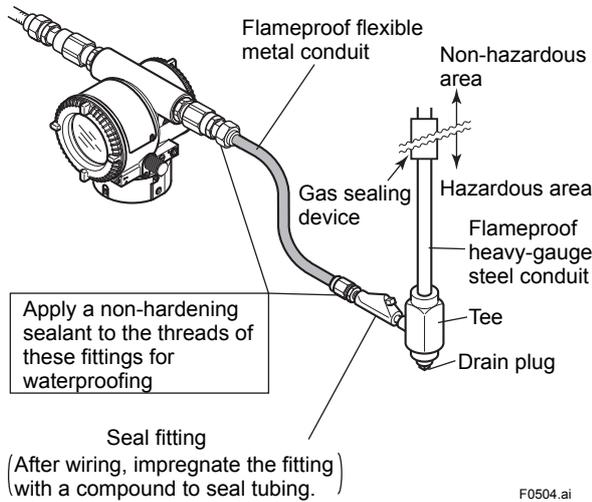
Typical Wiring Using Flameproof Metal Conduit
